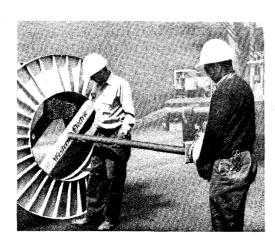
Fitting the Spindle Into the Cable Reel Spokes
